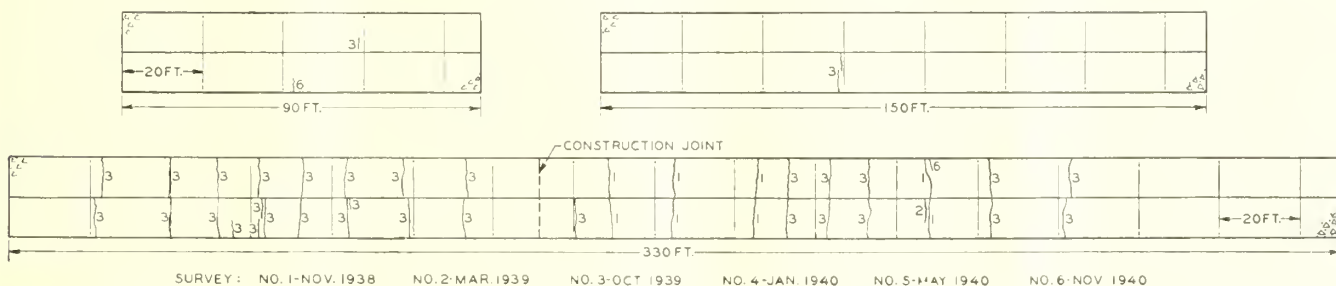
TYPICAL CRACK SURVEY SHEET FOR INTERMEDIATE-LENGTH SECTIONS REINFORCED WITH 1/2-INCH DIAMETER STEEL; SECTIONS PLACED SEPTEMBER-OCTOBER, 1938.
